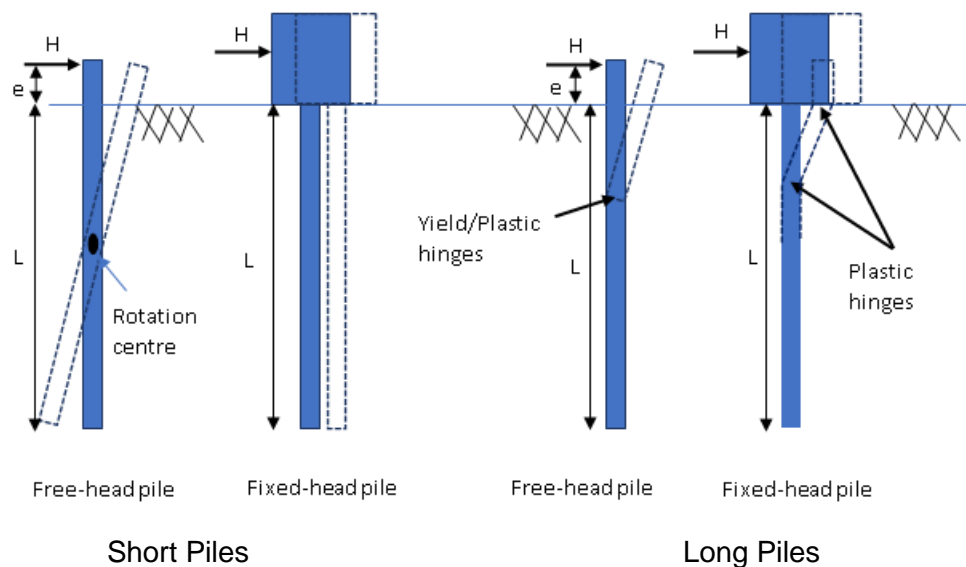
Failure modes of long and short piles subjected to lateral loadings (Tomlinson and Woodward 2008)
